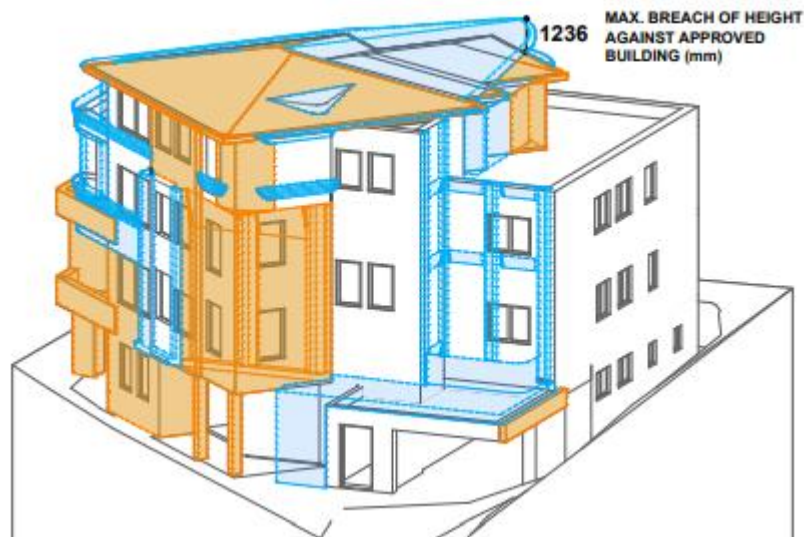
Proposed Reduction and Addition to Building Bulk/Envelope
